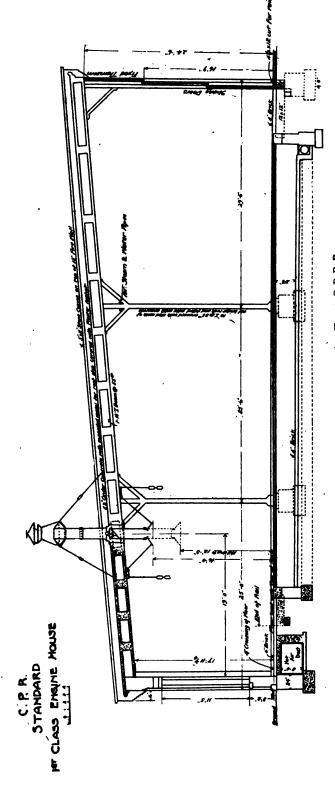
Standard First Class Engine House, C. P. B. R.
